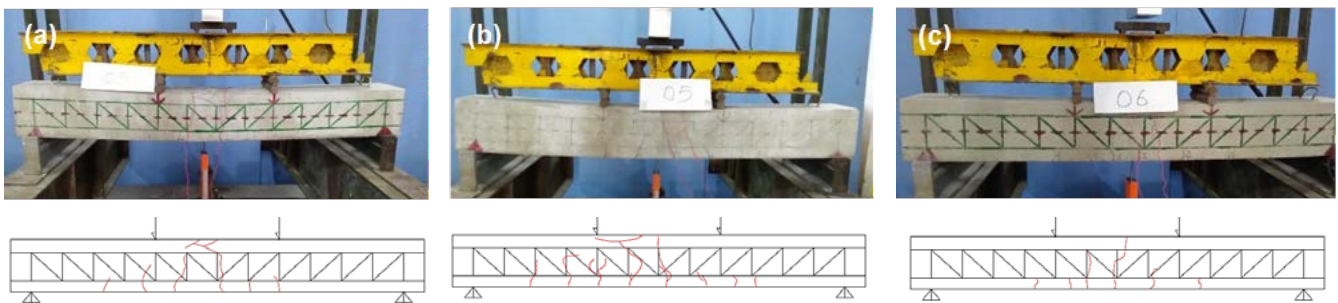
Crack pattern of Pratt-truss reinforcement system for (a) BP-1, (b) BP-2, and (c) BP-3
